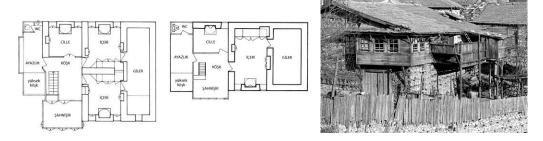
Typical and semi-typical plan types of Ormana houses and a view of a typical house. Source: Günay, 2017
